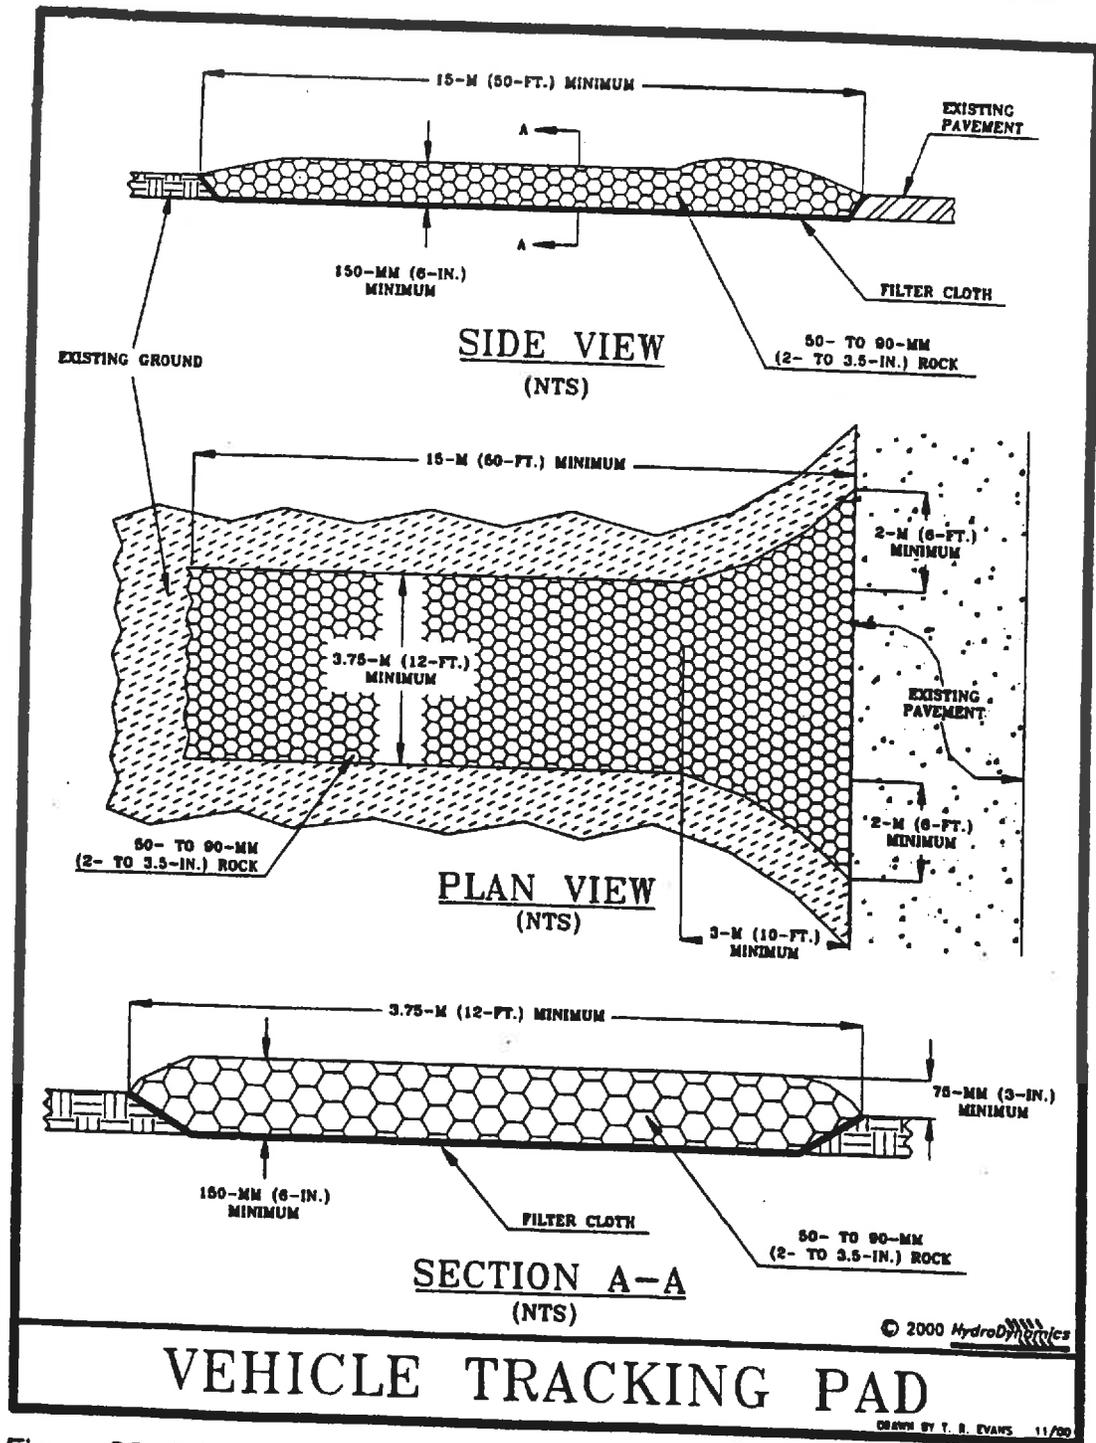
A Vehicle Tracking Pad Installed at a Construction-Site Entrance
